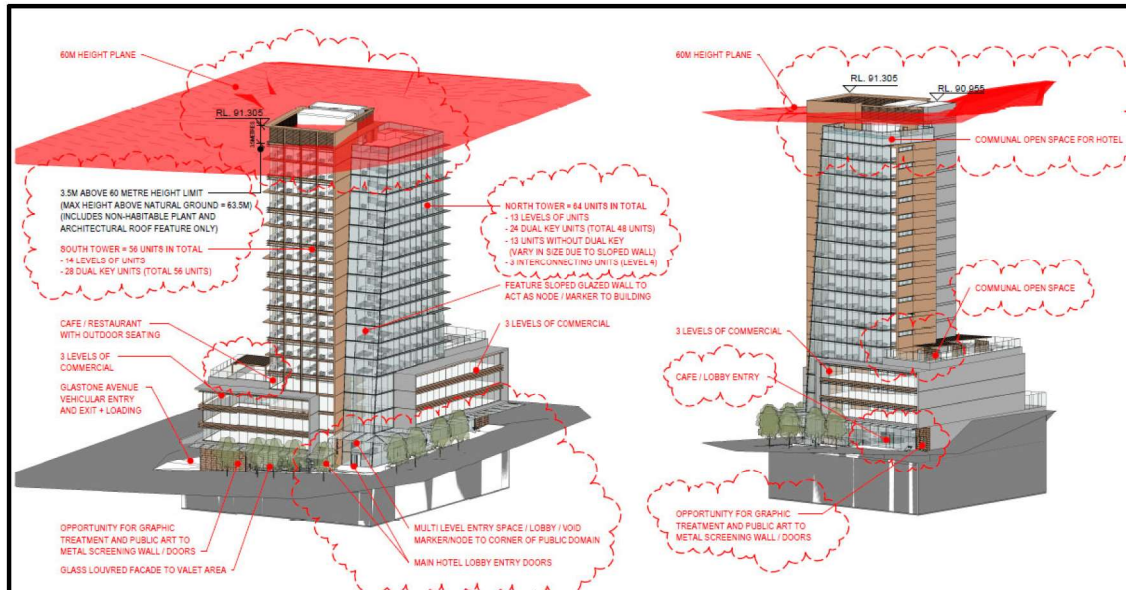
Proposed 3D Views showing 60m height building plane (*Source: DWA)
